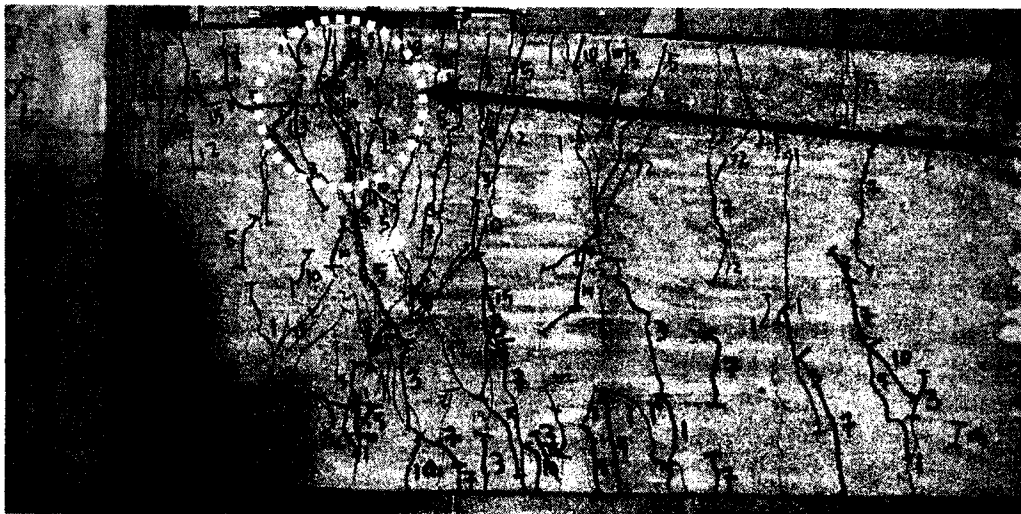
Cracking of beam- column joint at various drift levels (Specimen 1)
